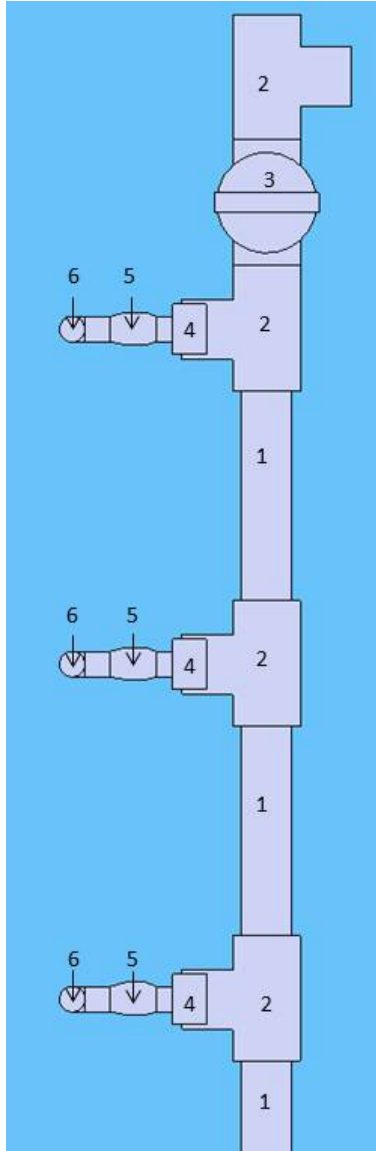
Outlet plumbing:(1) 2" PVC pipe (2) 2" tee (3) 2" ball valve (4) 2" to 1" reducing bushing (5) 1" swing check valve (6) 1" elbow
